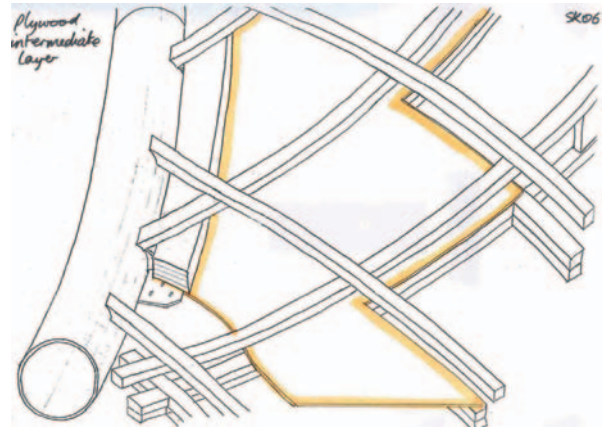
Edge detail / Fig 9. Edge plate fitted on site
